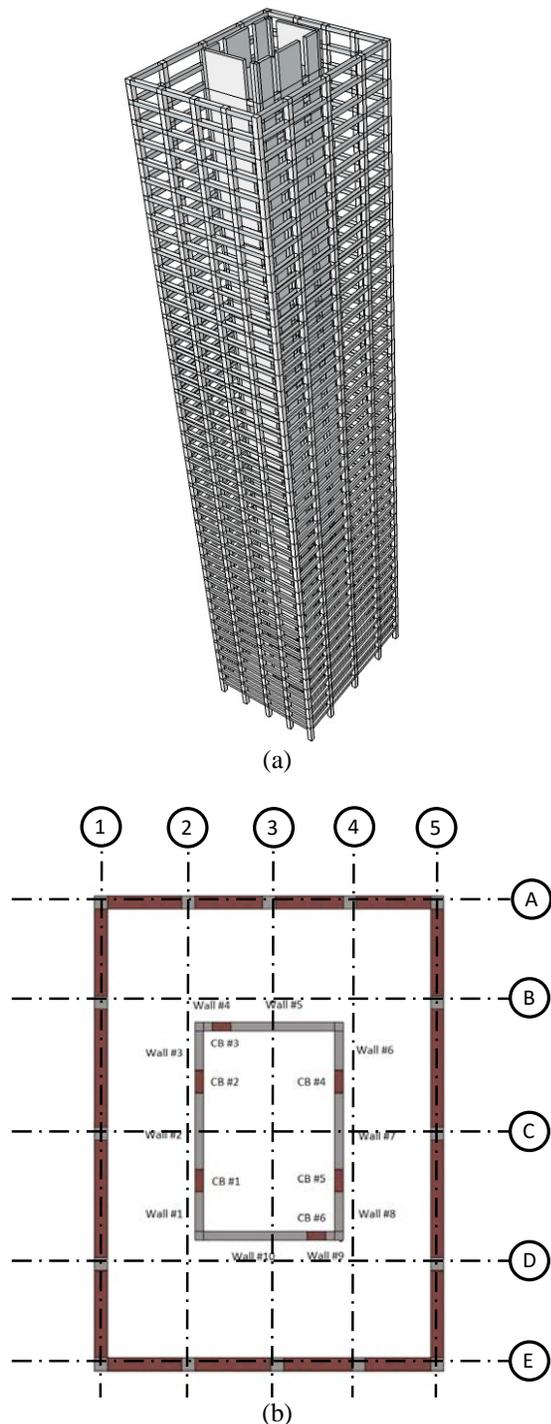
(a) Isometric view and (b) plan layout of dual moment frame system
